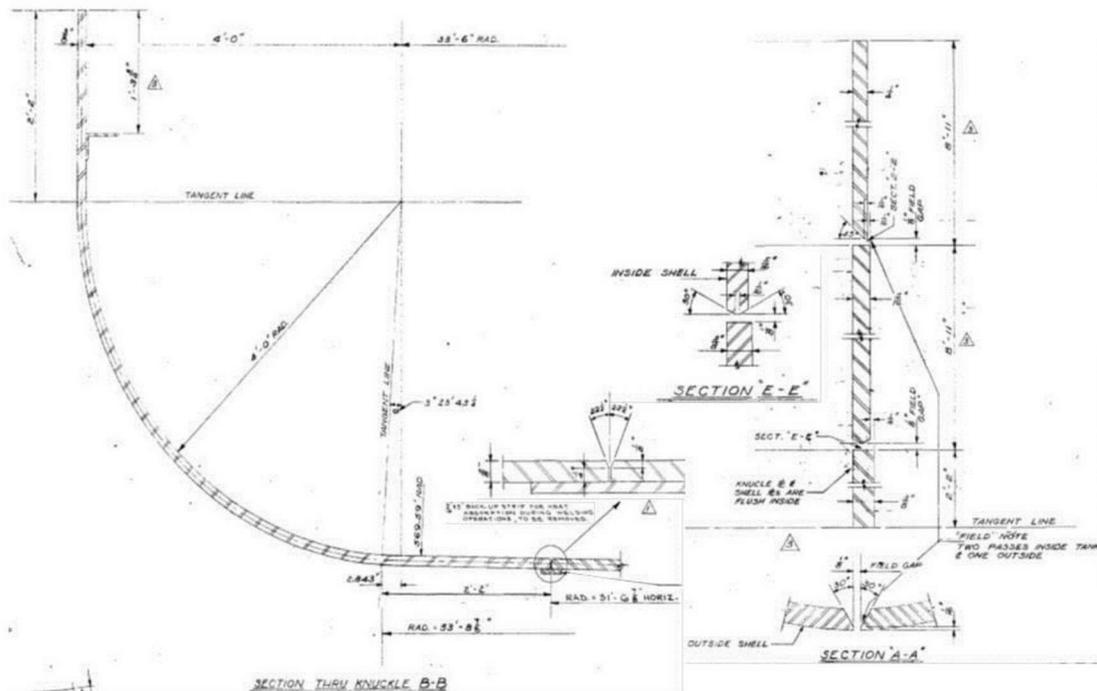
Construction Drawing for 241-BY Farm, 100-Series, Type III Tanks Bottom Knuckle Weld
